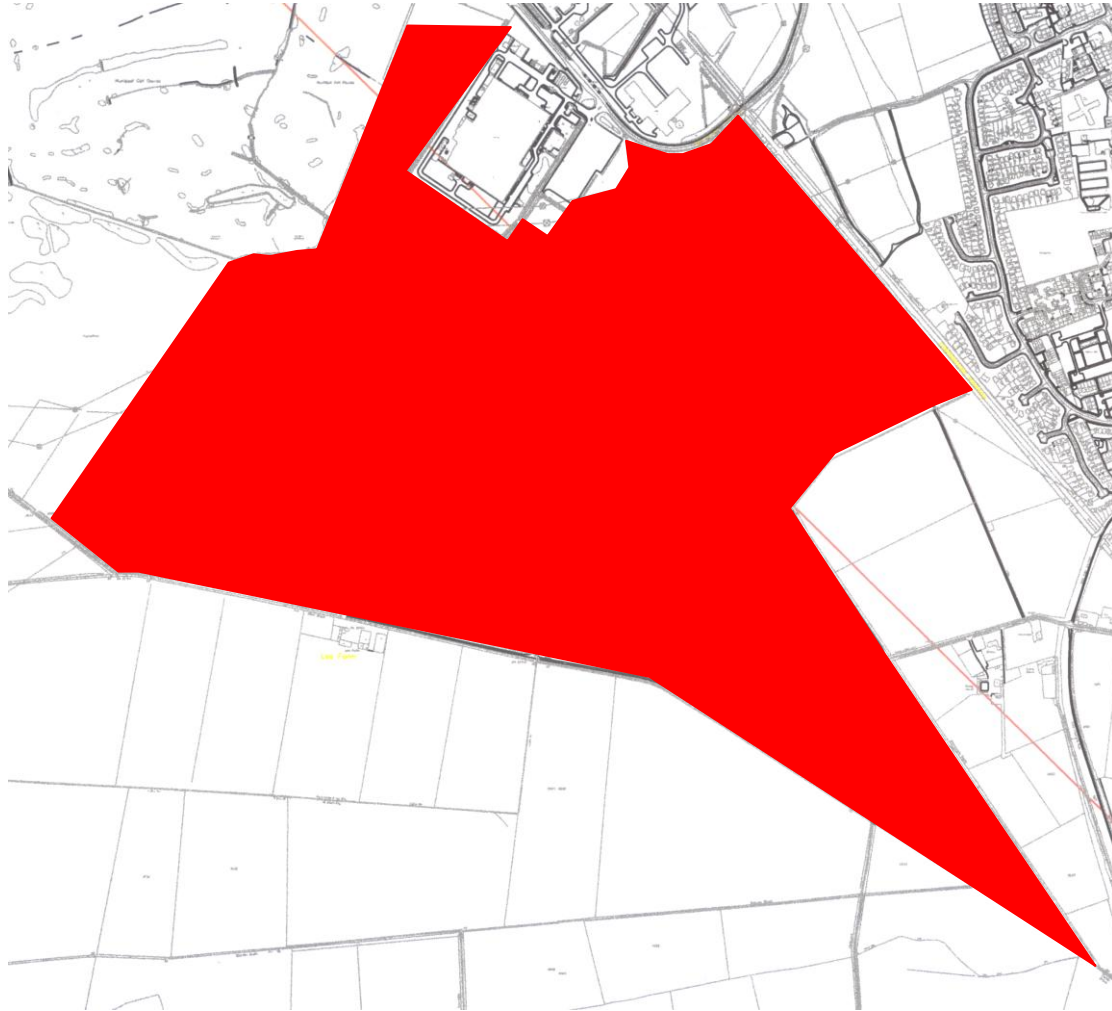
Site location plan. Scale 1: 10,000. Provided by developer
